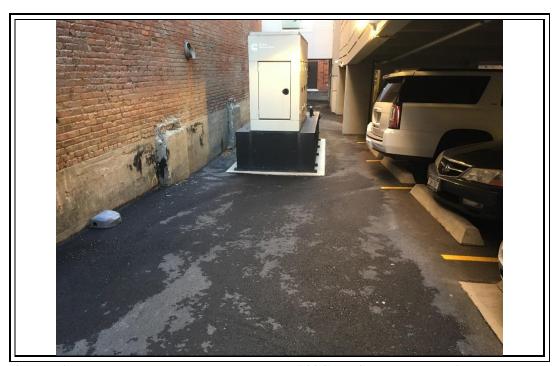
Looking northeast; asphalt cover between 144 State Street and parking garage; emergency generator unit on concrete pad.
